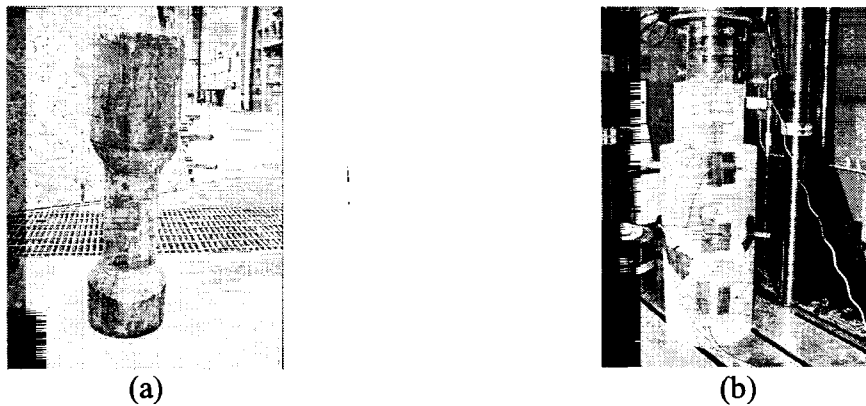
(a) Damaged Wood Pile Section (62% reduction), (b) Damaged Wood Pile Section with FRP Composite Shells and Cement-Based Grout (Repair System B)
